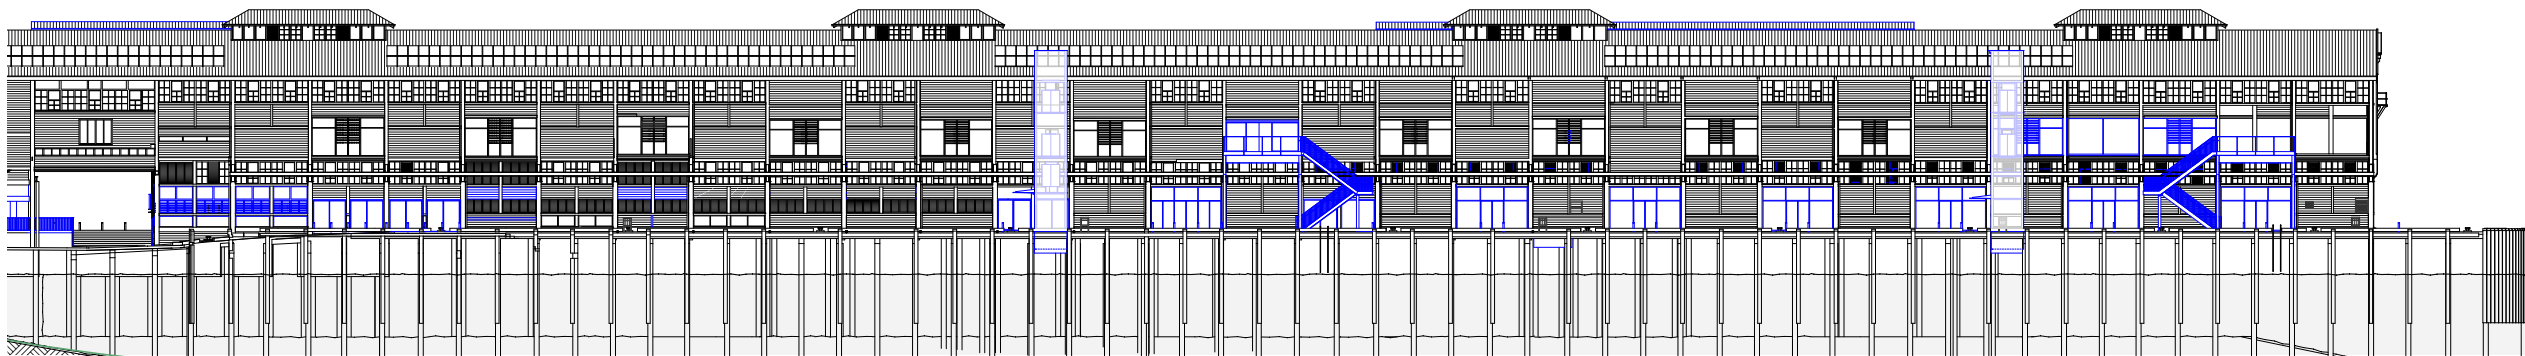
Proposed East elevation Wharf 4/5, (alterations shown in blue).
